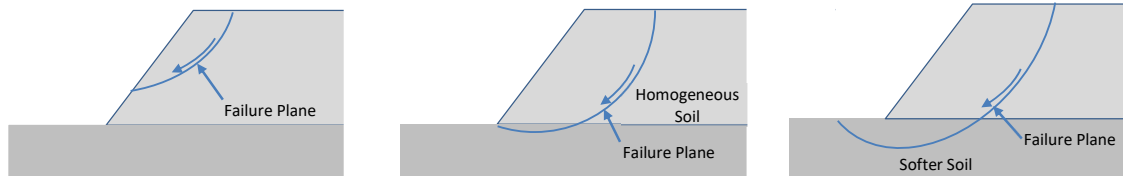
a) Face failure, b) Toe failure, and c) Base failure
